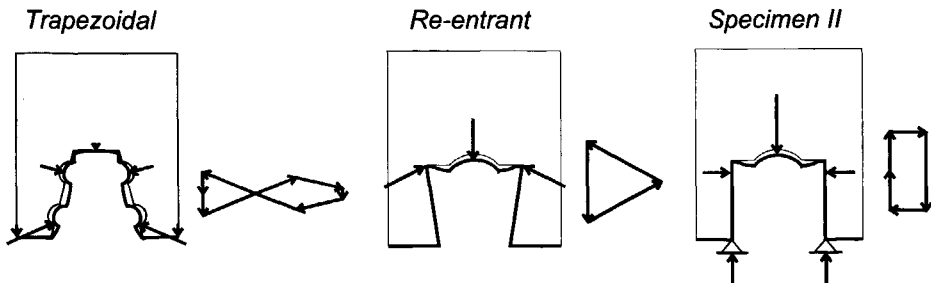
Equilibrium of forces in the cross-section of the sheeting
